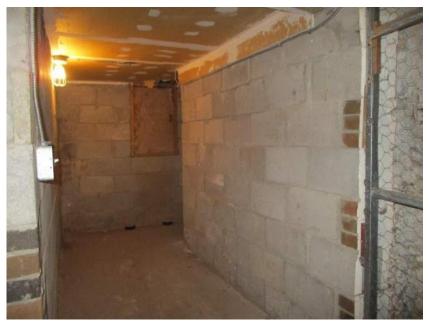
View of typical concrete masonry unit foundation in the newer addition to the building (interior hallway, south addition).
